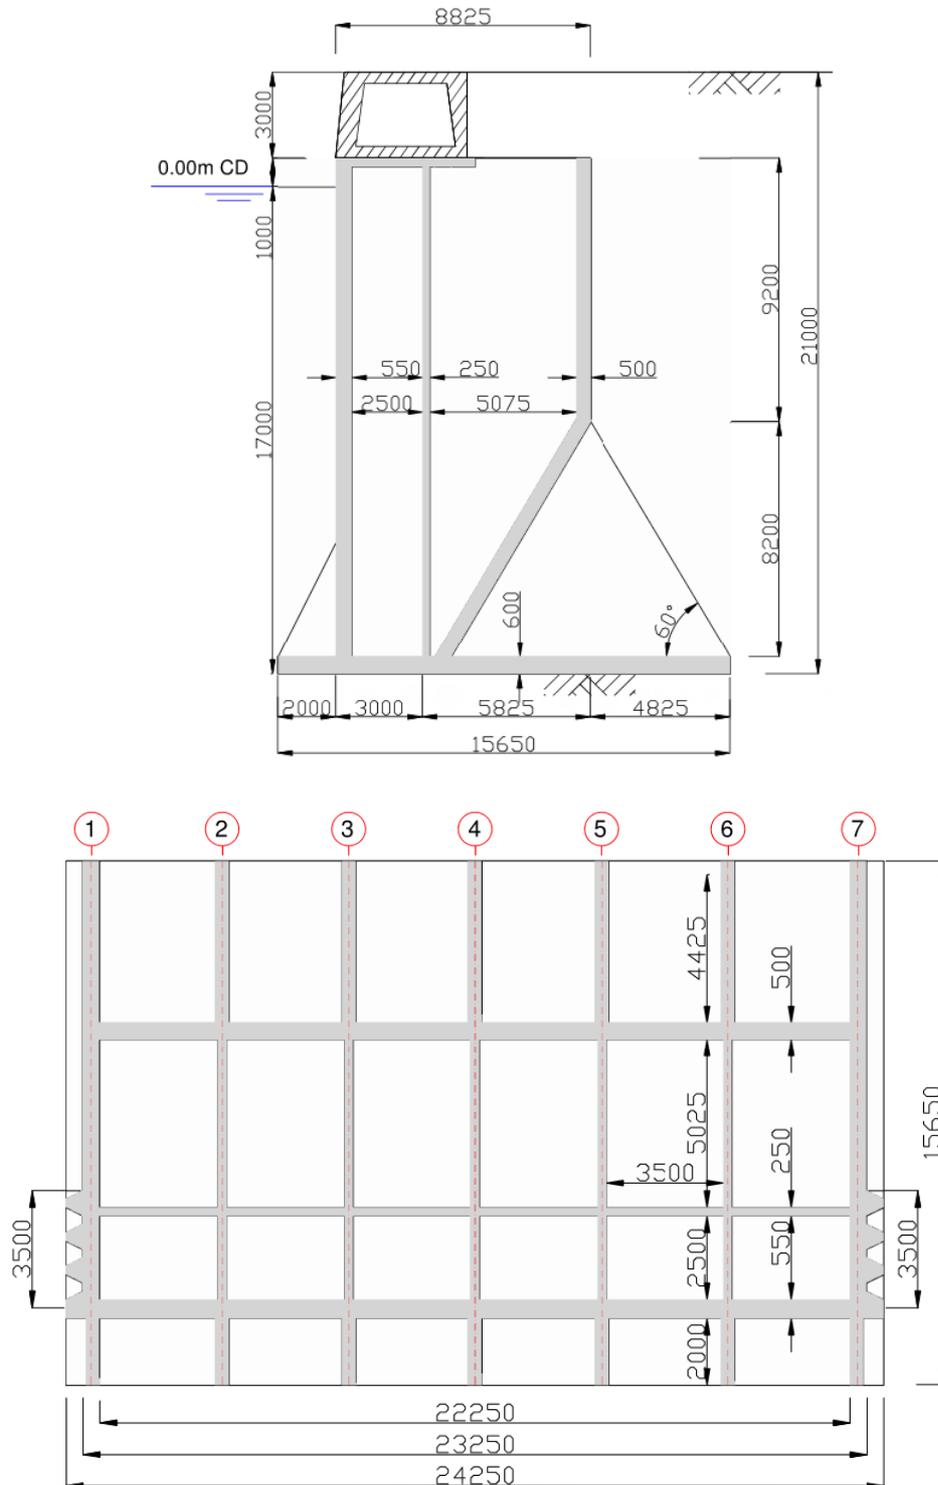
Cross-sections of the overturning caisson (15.65m)
